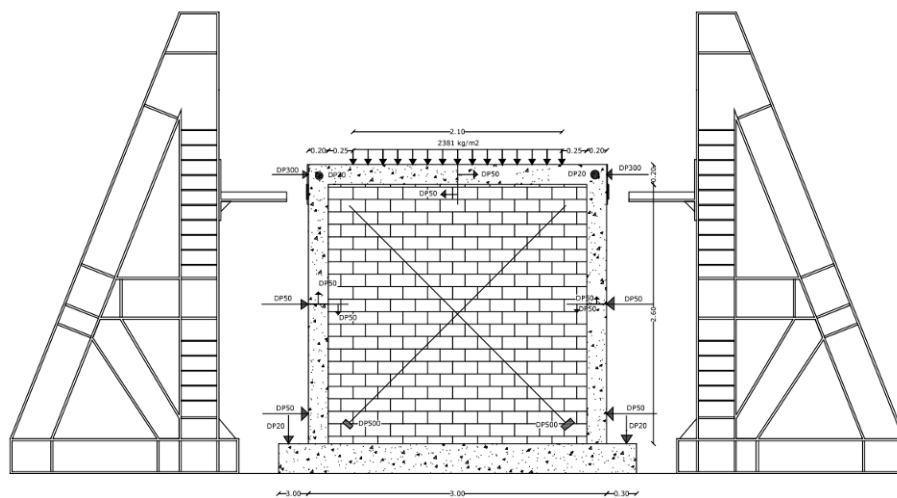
Elevation View of Tested Wall and Positions of Electrical Transducers
